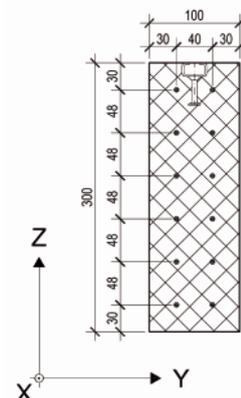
cross section of a three-storey rectangular HPSCC facade element (12 CFRP tendons, window connection over stainless steel 'cup' inlays at the inner short edge)
